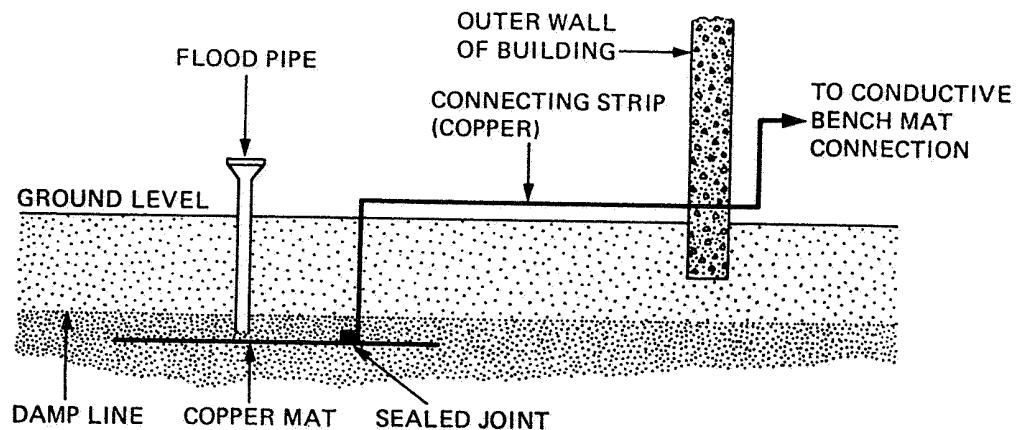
TYPICAL GROUNDING ARRANGEMENT
